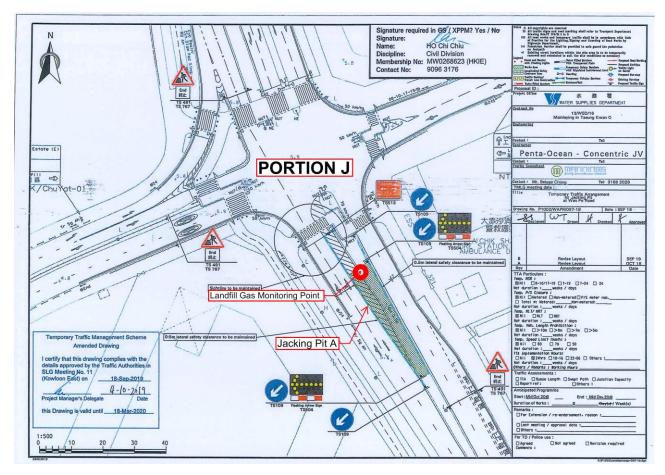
Location Plan for Portion J - CH. A13+50 to CH.A 14+00 (Pit A)
